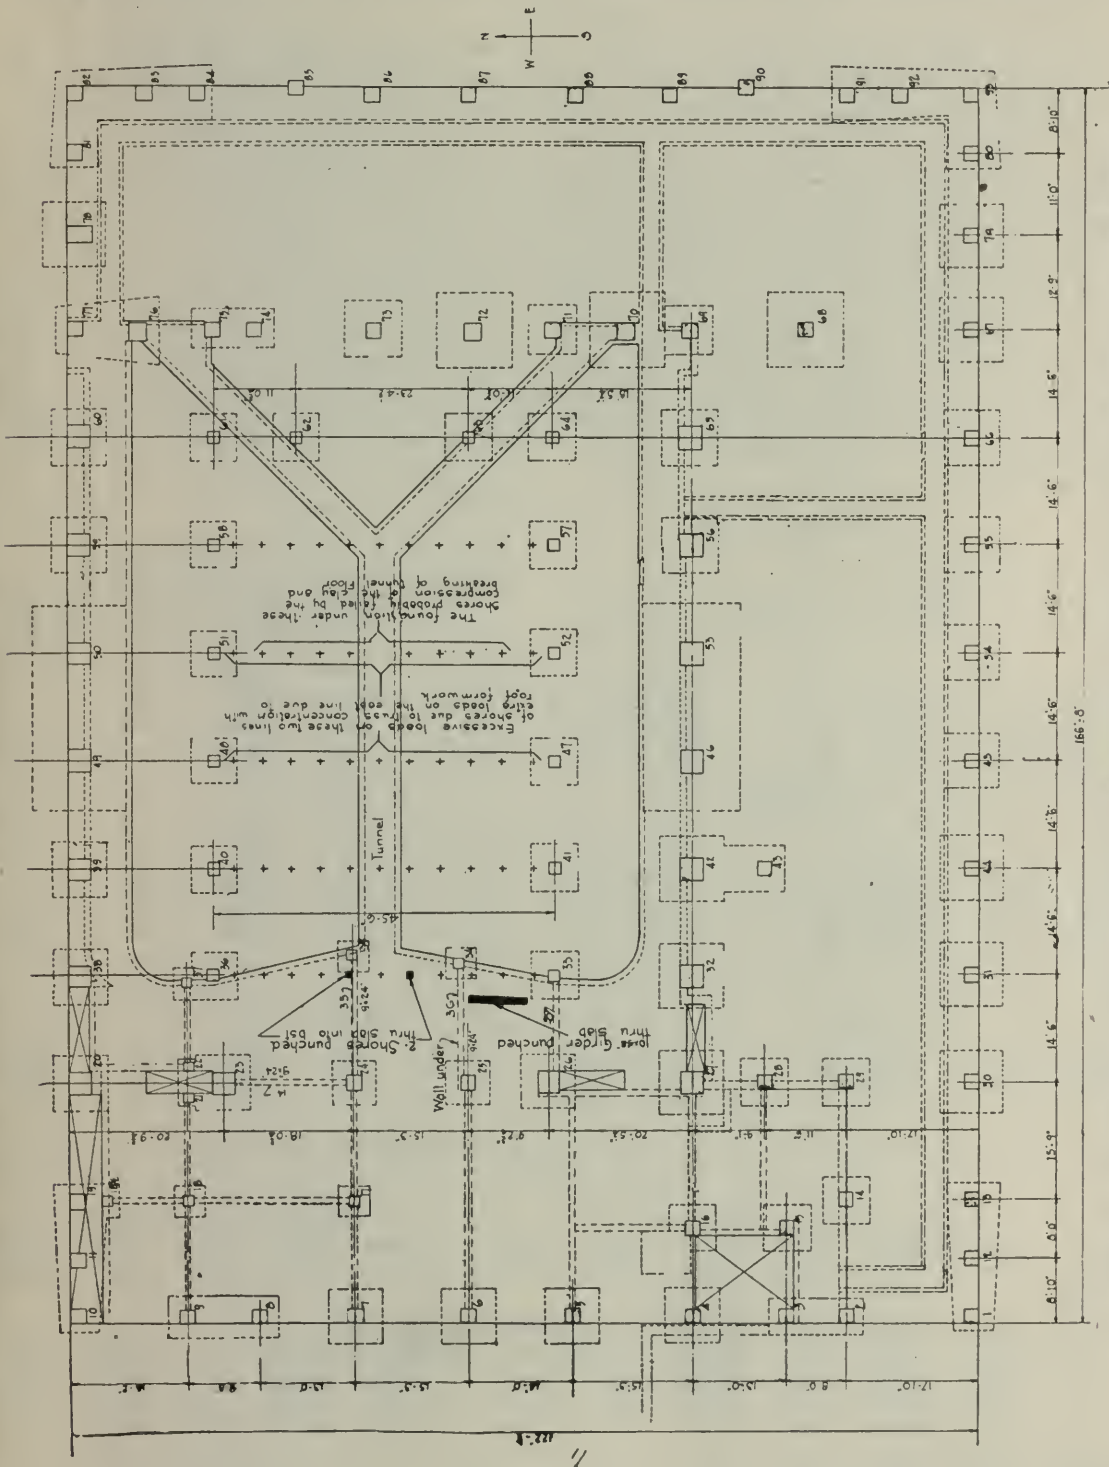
Ground floor plan of the Temple, showing the location of the shores reported to have been in place under the first floor girders and resting on the ground, or on the trench floor. It will be noted that there were no shores reported as being under the slabs of the first floor.
